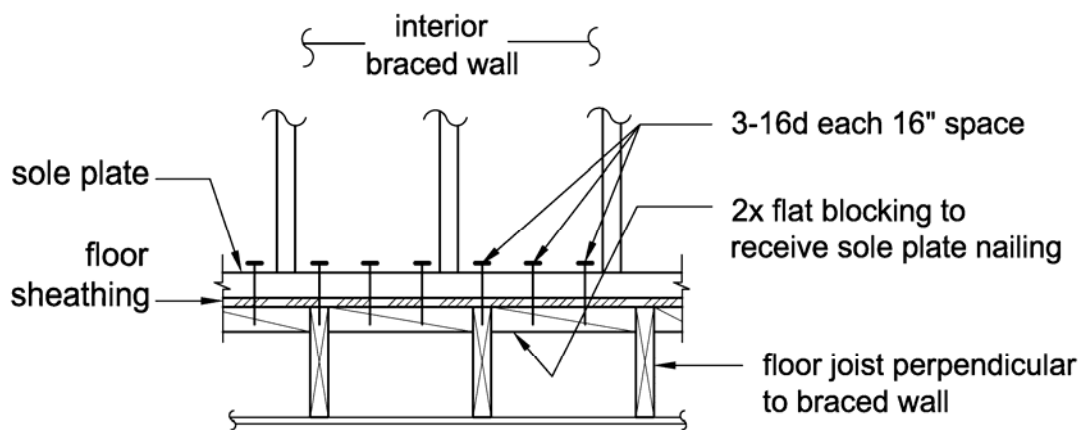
Blocking below interior braced wall where floor joists are perpendicular to wall.
